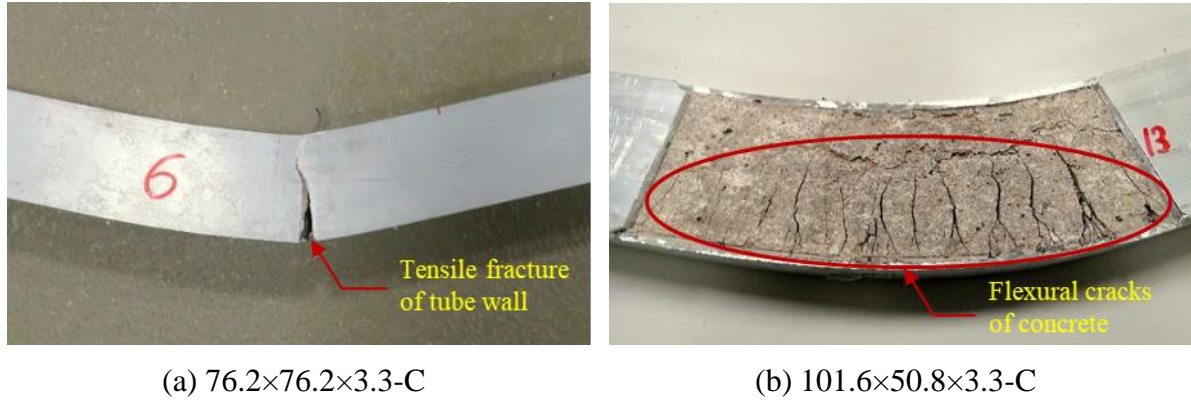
(a) Tensile fracture of tube wall, (b) Typical failure modes of concrete.
